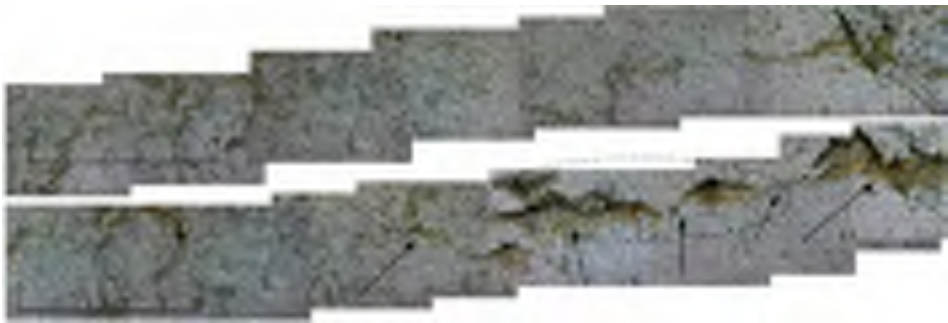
Borehole video prospection of rock mass damage around tunnel profile before and after blasting [4]
